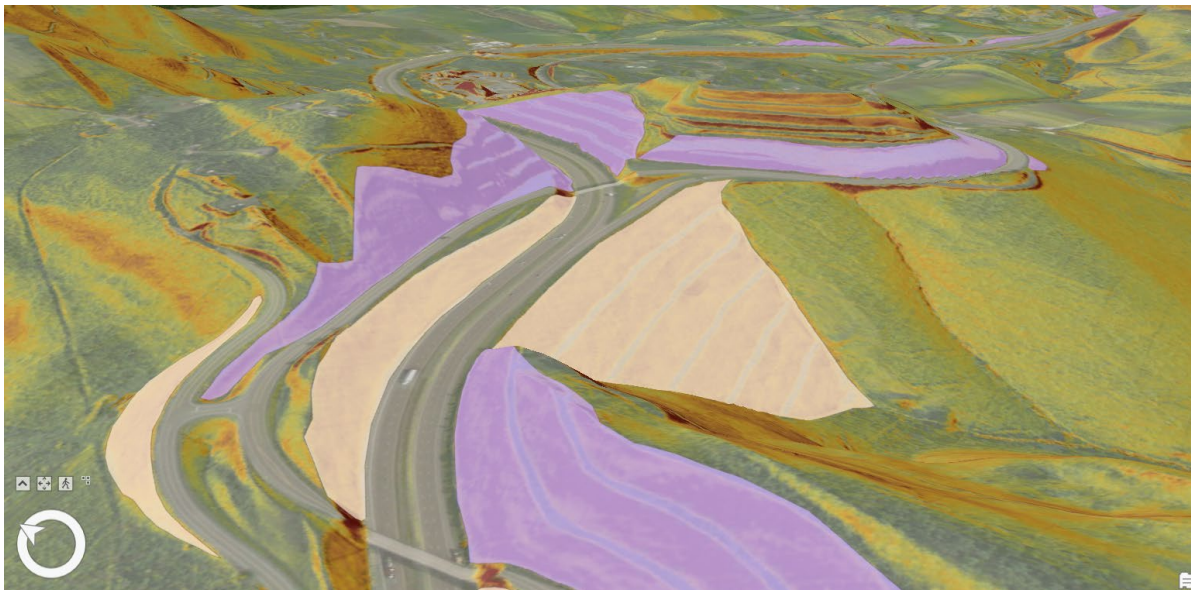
Colored zones of elevation change from highway mile points. Elevation of highway milepoints was compared with elevations of the surrounding 150 feet. Shades of blue indicate embankment zones. Shades of yellow and red indicate cut slope zones.
